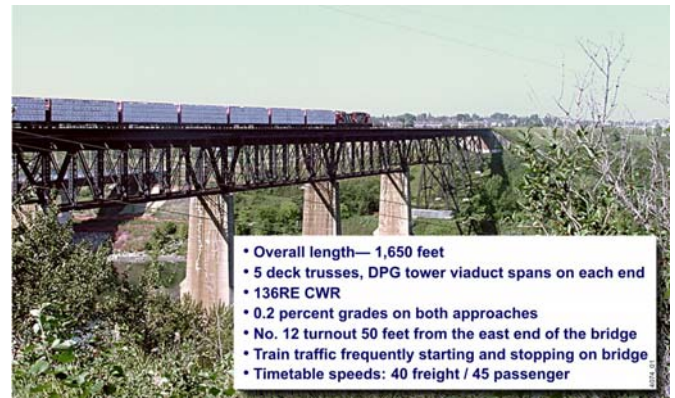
1,650-foot Open-Deck Steel Bridge Tested in 2003-2004
